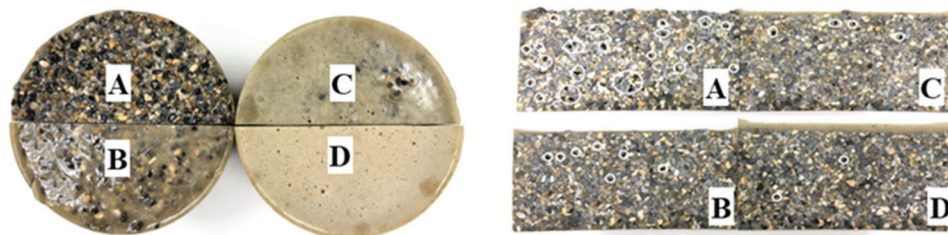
Cylinder specimens: (a) plan view and (b) cross section.
